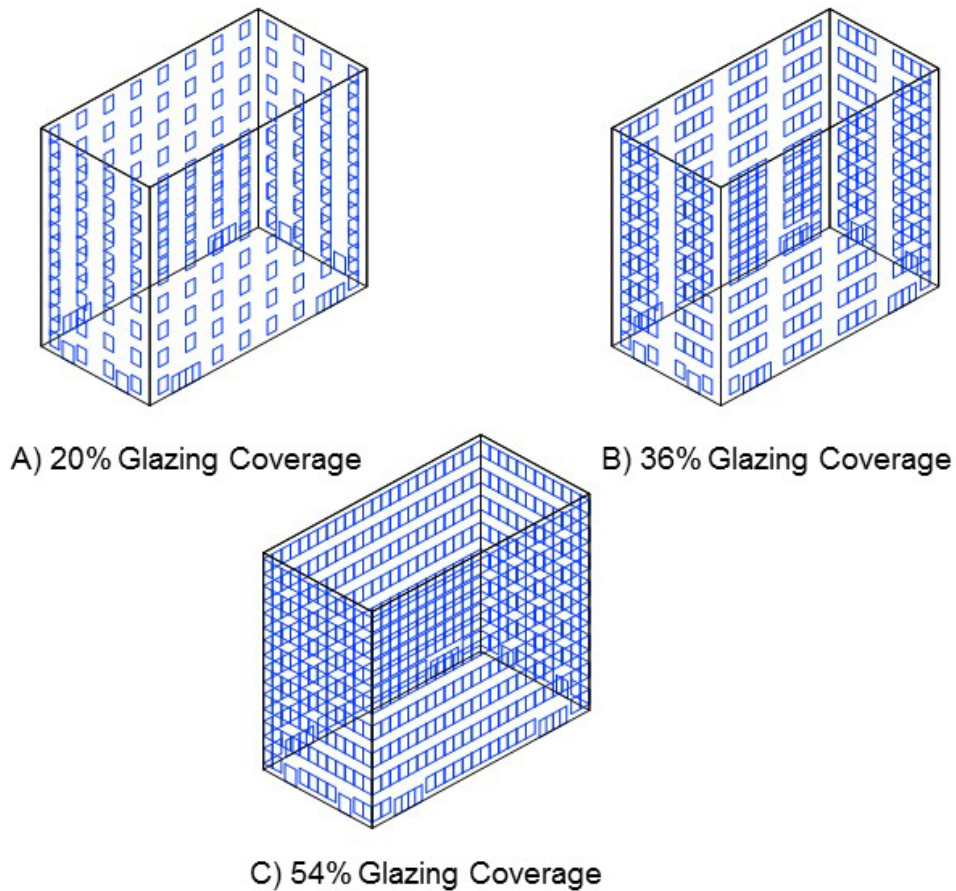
Modeled Eight-Story Fully-Engineered Buildings
